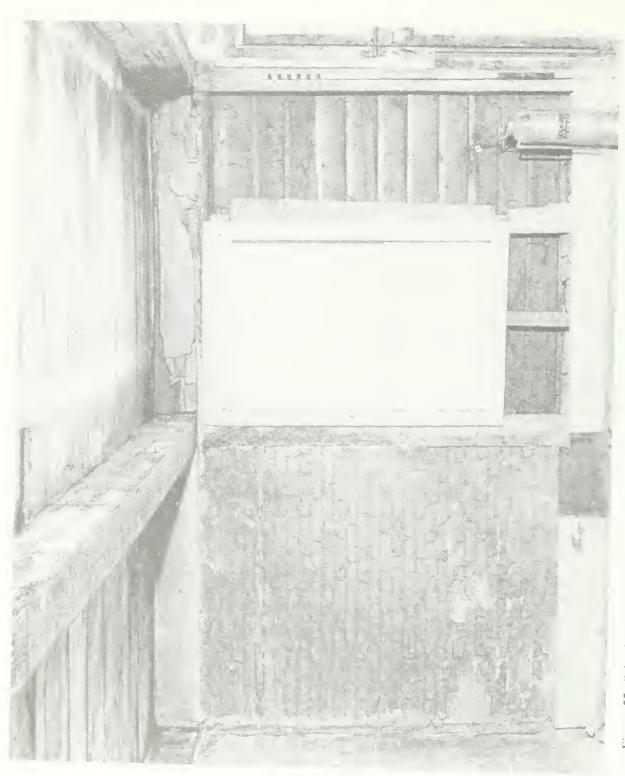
Schuyler House: First story of kitchen wing after ca.-1815 lath and plaster removed; framing for ca.-1780 doorway in south wall of kitchen (Room 105) blocked by later east-tier staircase (1958).
